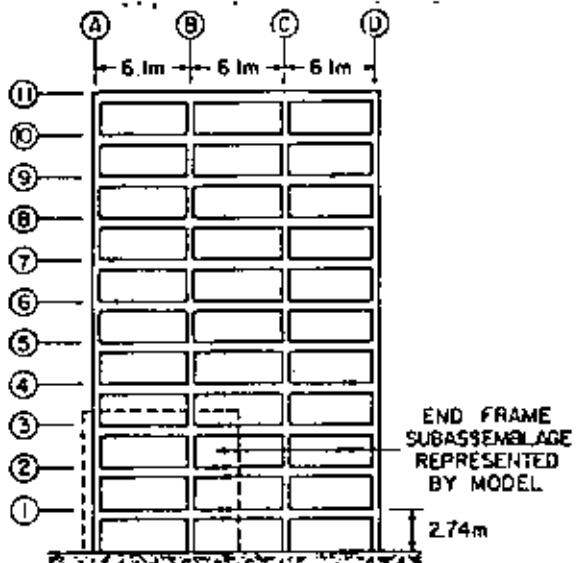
END FRAME ELEVATION - PROTOTYPE
